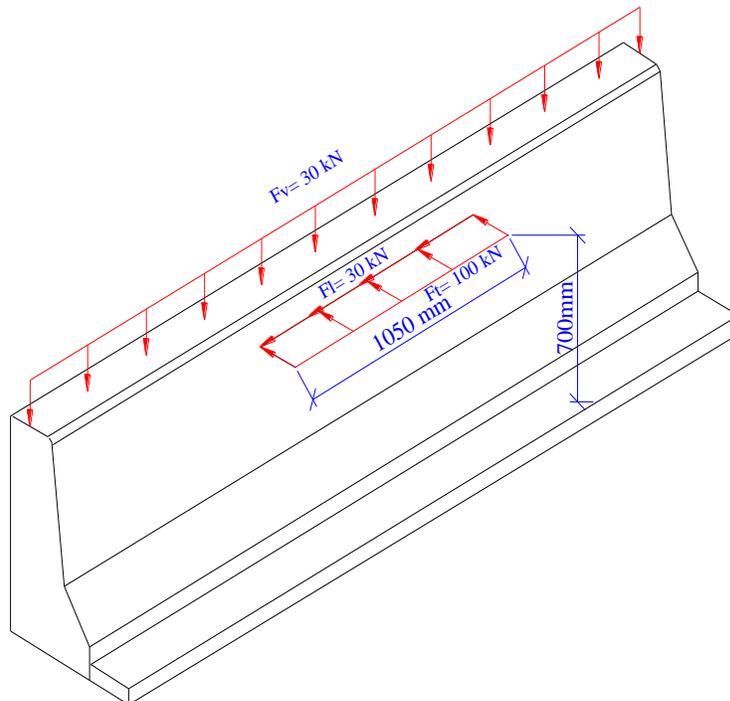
Locations of load on PL-2 barrier as per CAN/CSA-S6-06
